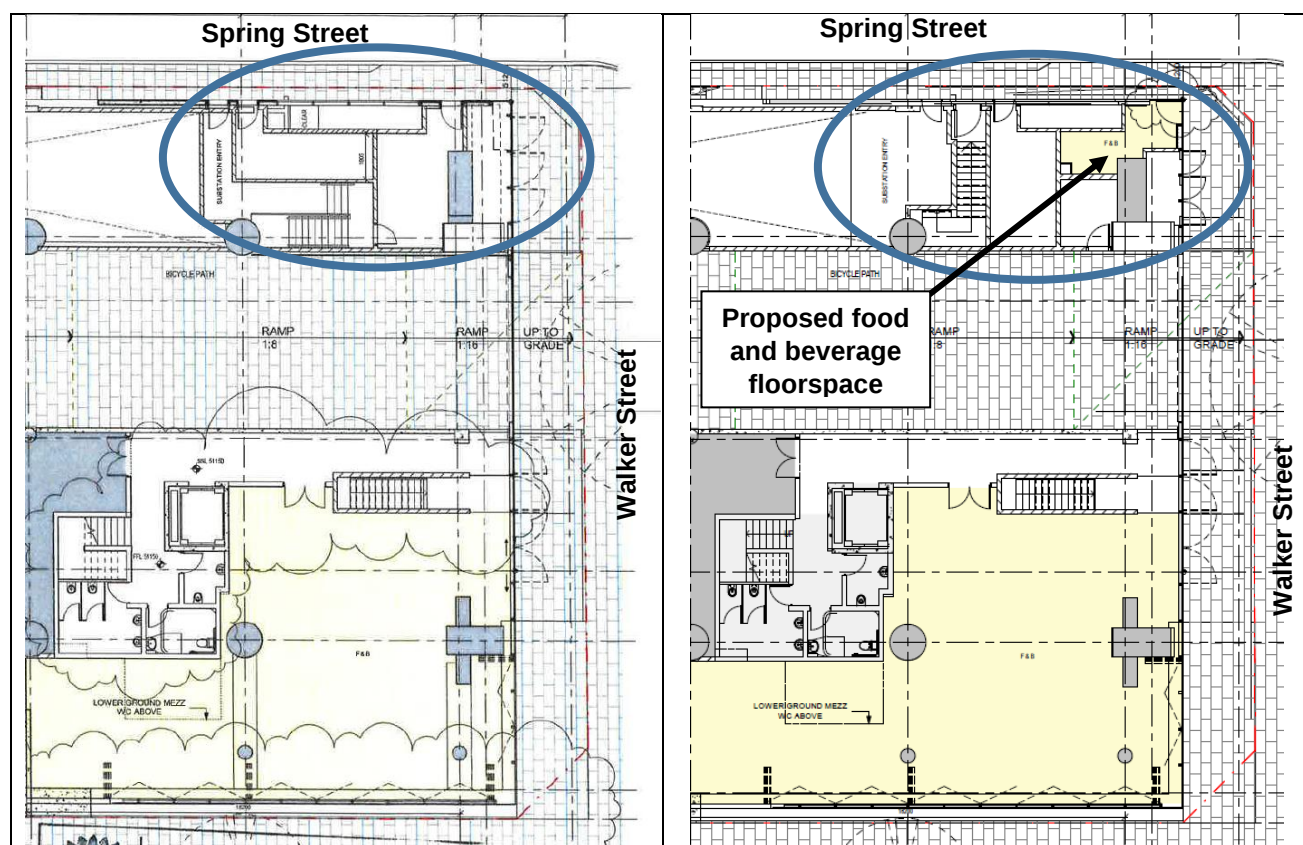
Location of the proposed new food and beverage floorspace (right), compared to the approved floor plan (Source: approved plan / proposed plan)
